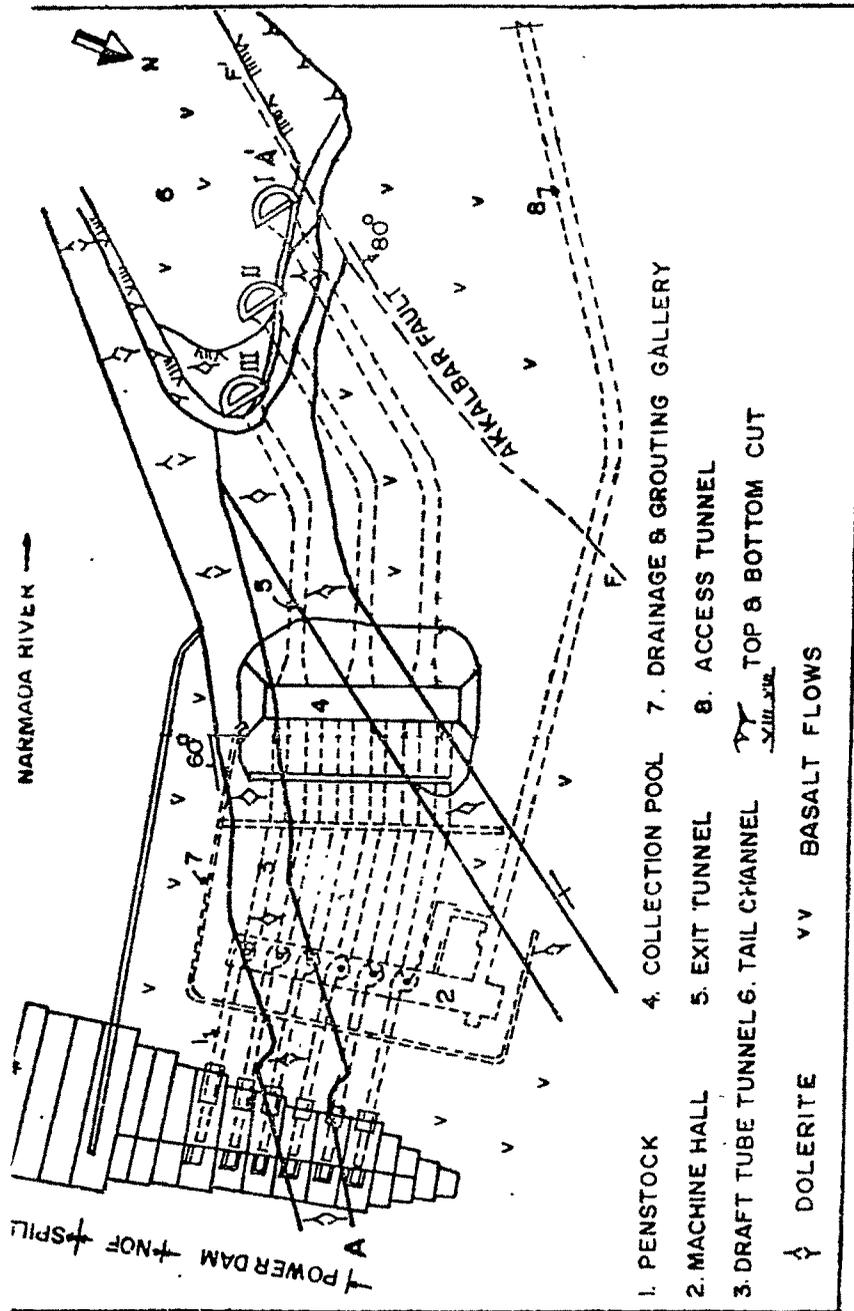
GEOLOGY AND LAYOUT OF UNDERGROUND POWERHOUSE
